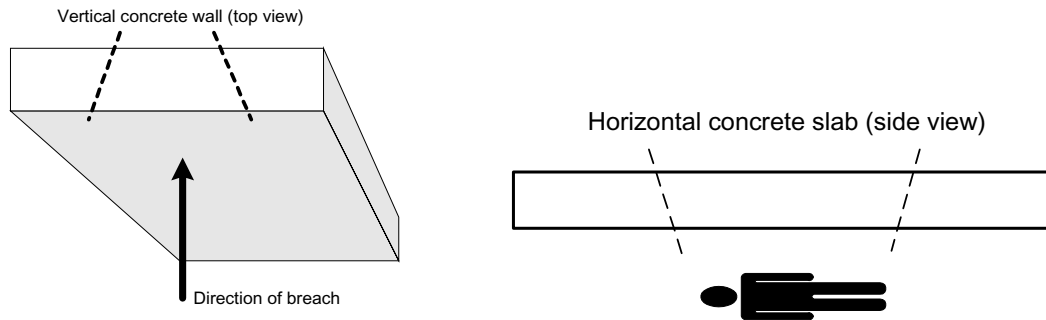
Cut concrete at an angle to prevent loose piece from falling on or toward victim.
